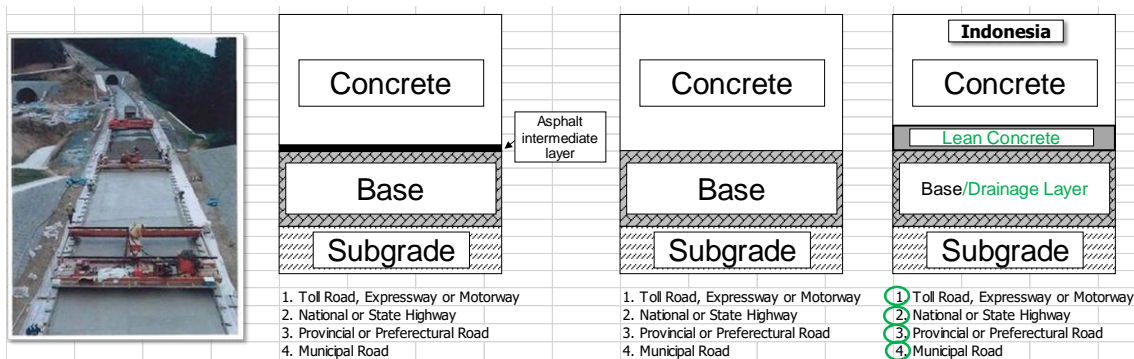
Concrete pavements, without asphalt intermediate layers and without steel mesh
